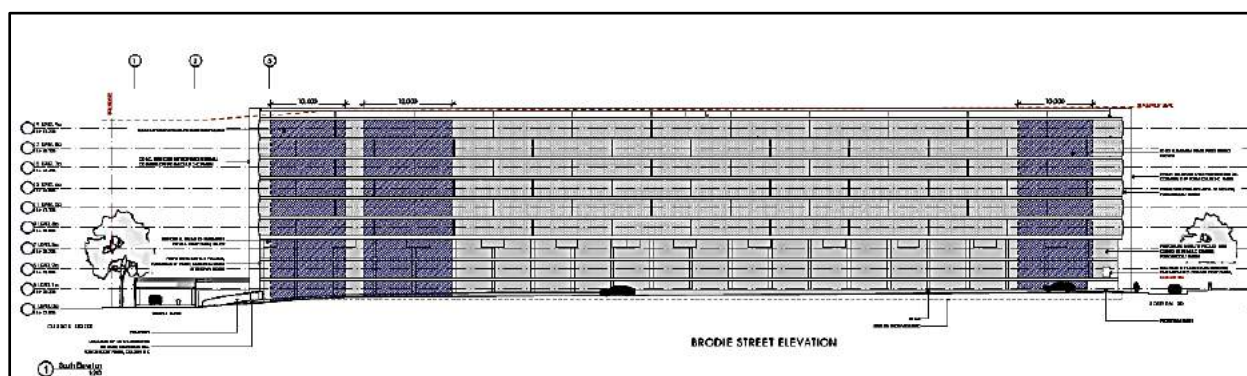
South Elevation (Source: Fitzpatrick + Partners, 26.04.2016).
